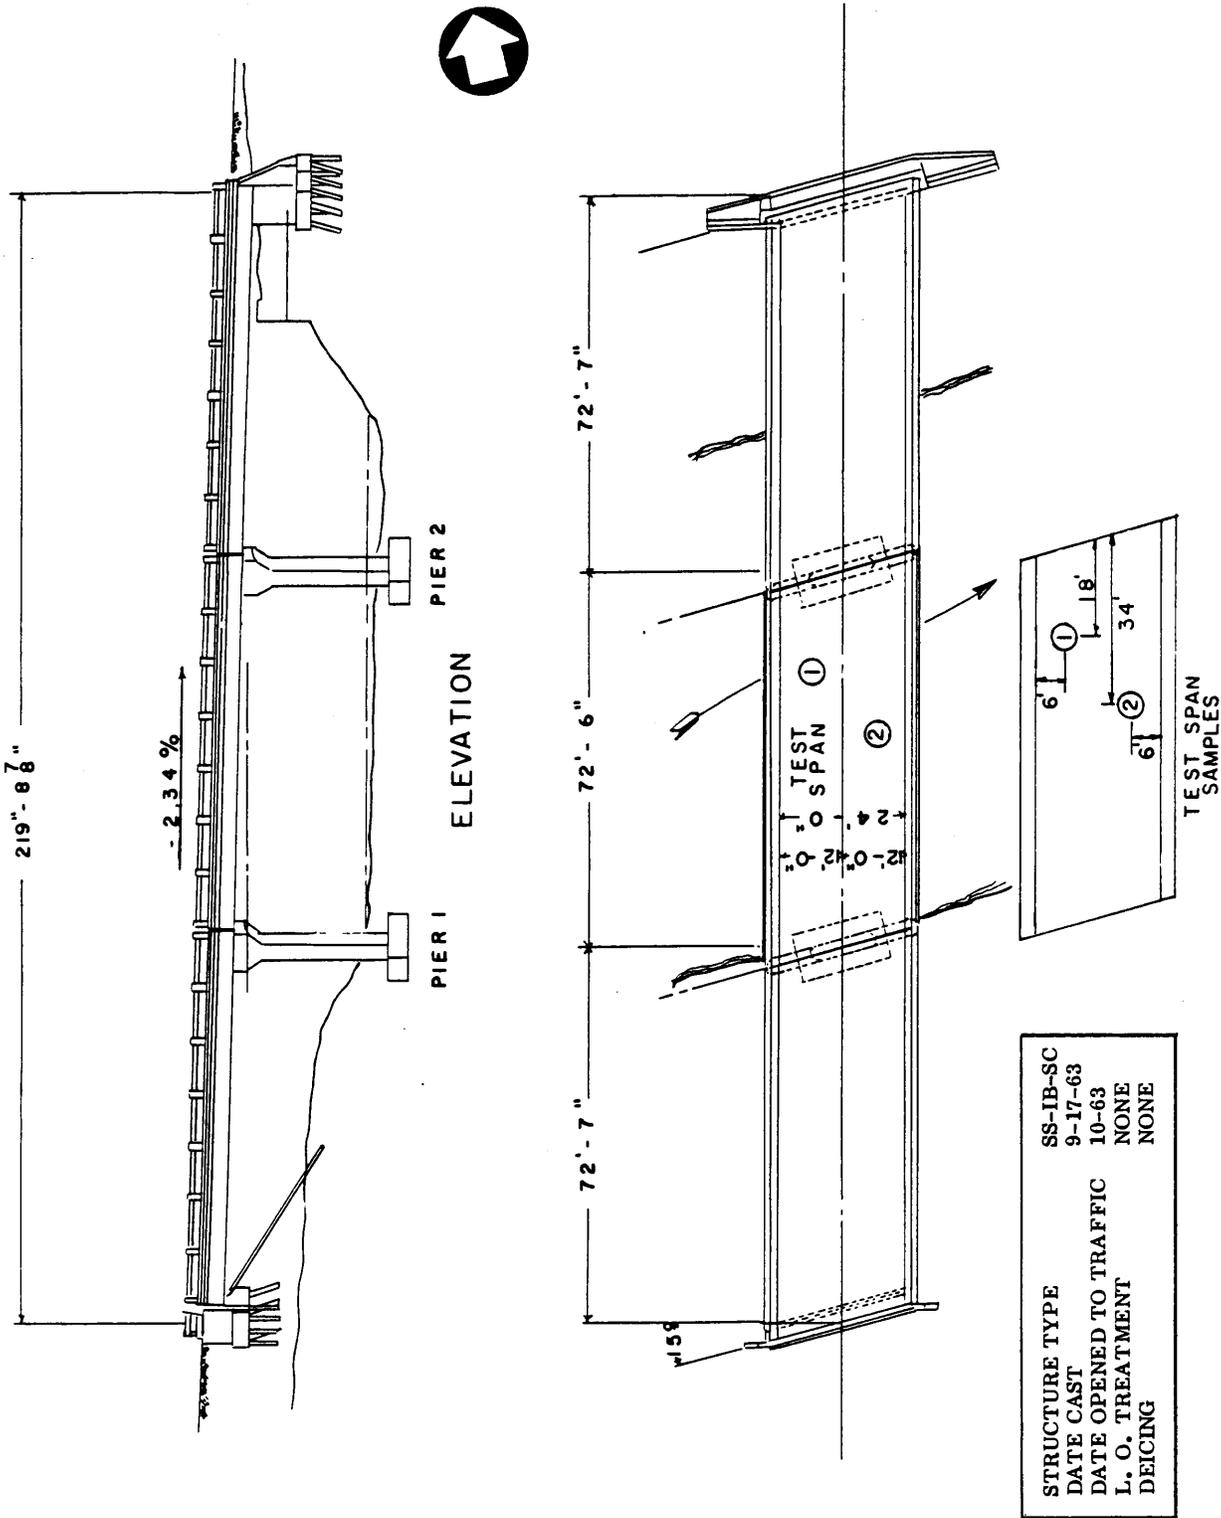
Plan for bridge #17; also shown are the locations of test samples.
